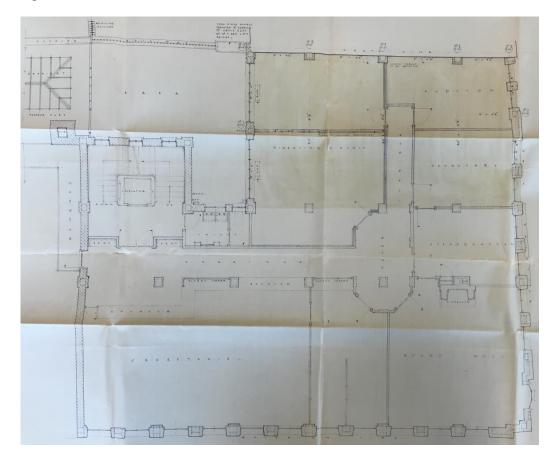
Architectural Drawing of First Floor of Summit House dated 1933¹⁹
